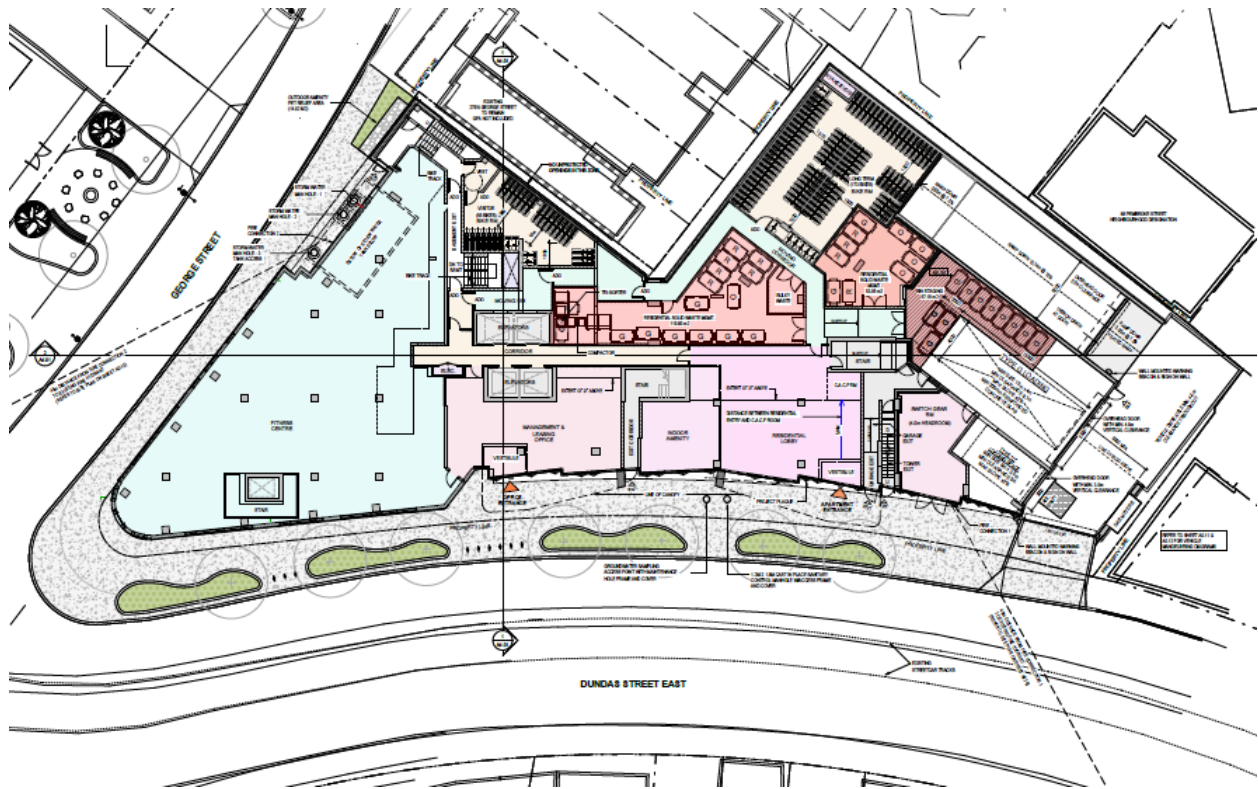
Ground floor plan for 212 Dundas Street East included for illustration purposes (Rafael & Bigauskas Architects Inc., February 23, 2026).
